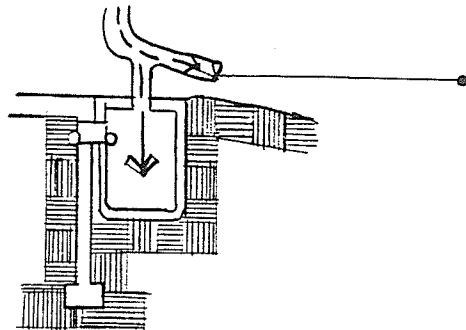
DETAIL OF AN UNDERGROUND SYSTEM
